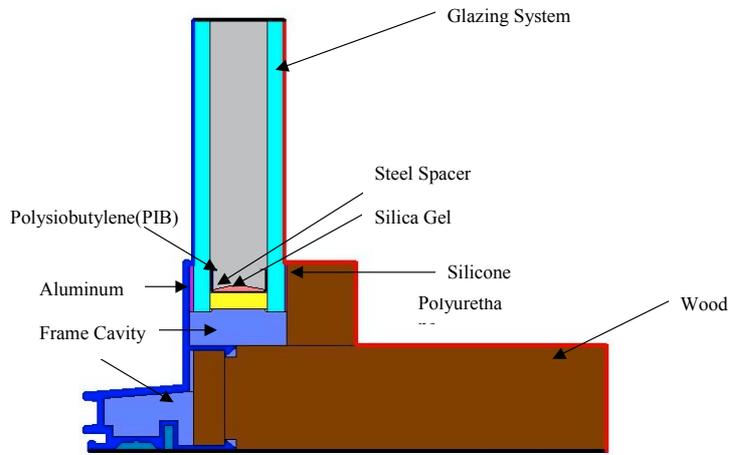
Cross Section of a Window Sill as Installed in Hot Box
